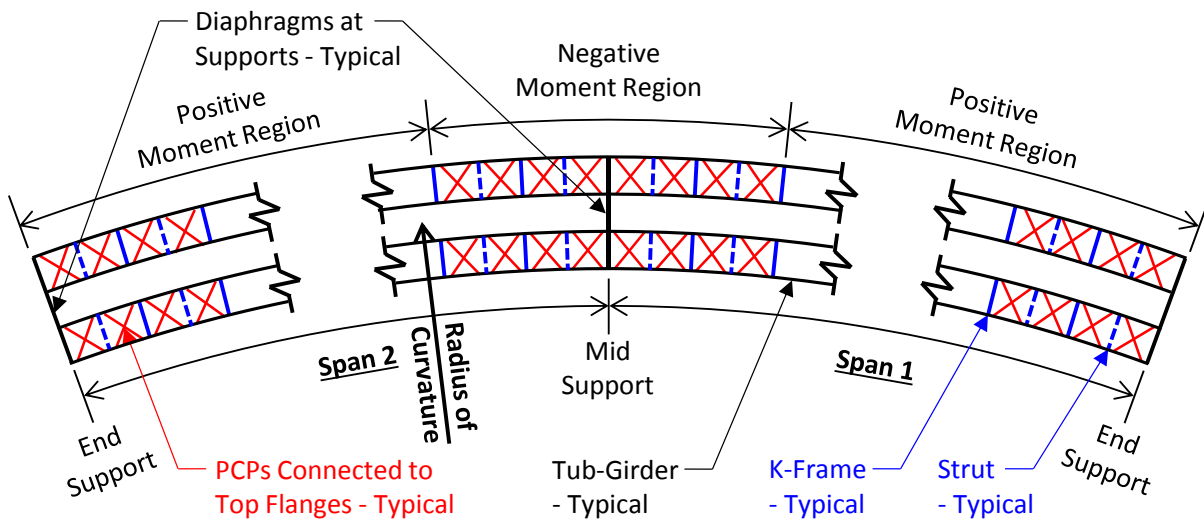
Tub Girder Layout for Parametric Study – Plan View
